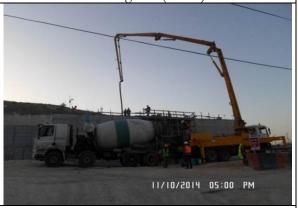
h of November, 2014: Casting concrete for balance tank wall (Section E2).
